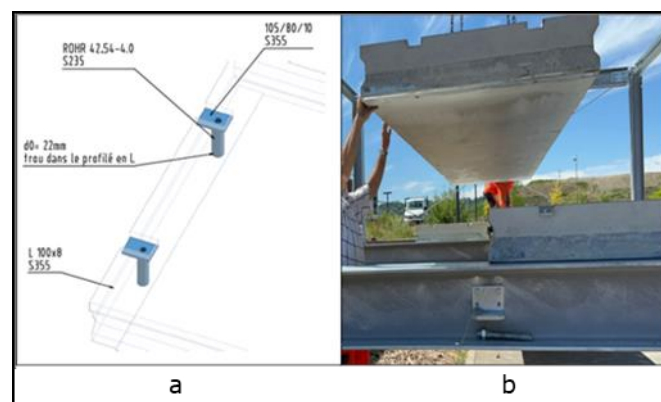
Flooring system of Petite Maison: a) steel L element with tubes and plates, b) Concrete slab containing the elements shown in figure 4.a
